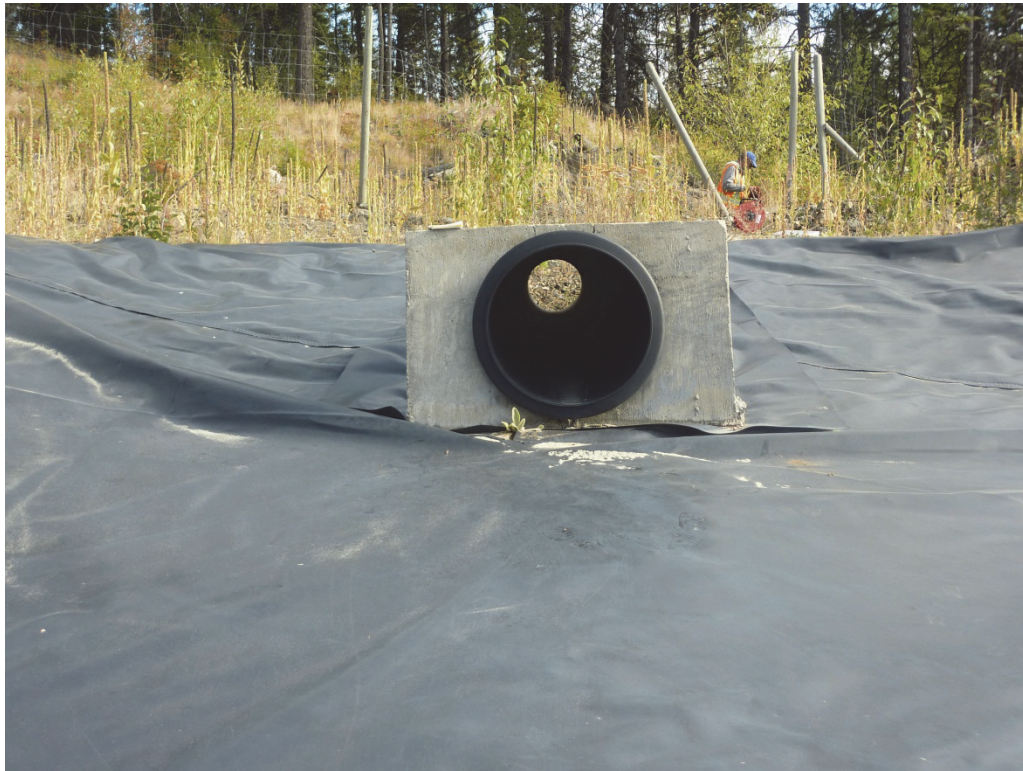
Tailings Pond – Surface Water Inlet Culvert at Northeast End of Dam Embankment
